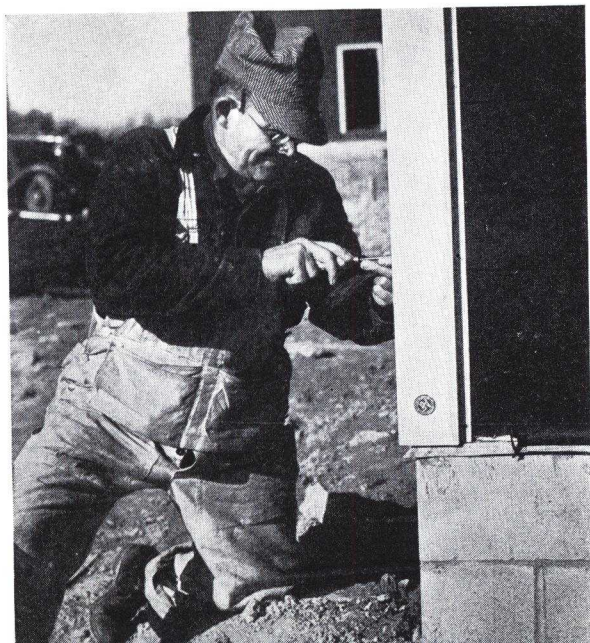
FIG. V—EXTERIOR DETAILS (below) include metal cornice and trim, well caulked; transite chimney; cement asbestos shingles laid over lapped strips of 40-lb. roofing felt as can be seen in this picture.
